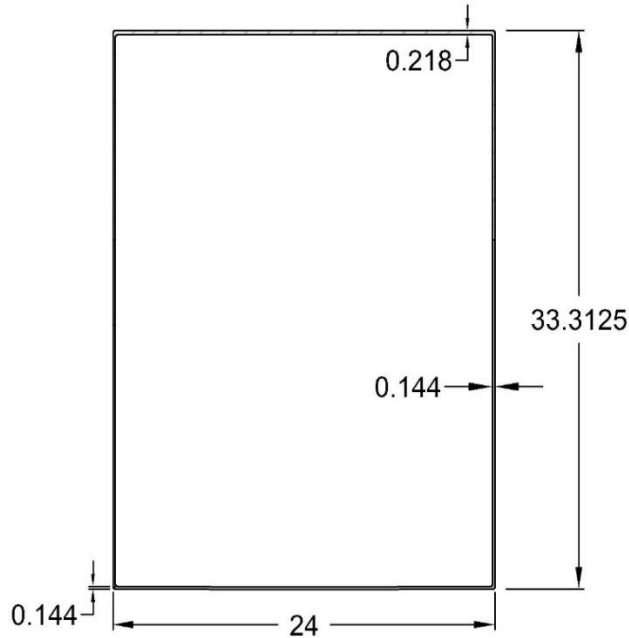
Cross section of the beam used for Case A. (Dimensions in inches)
